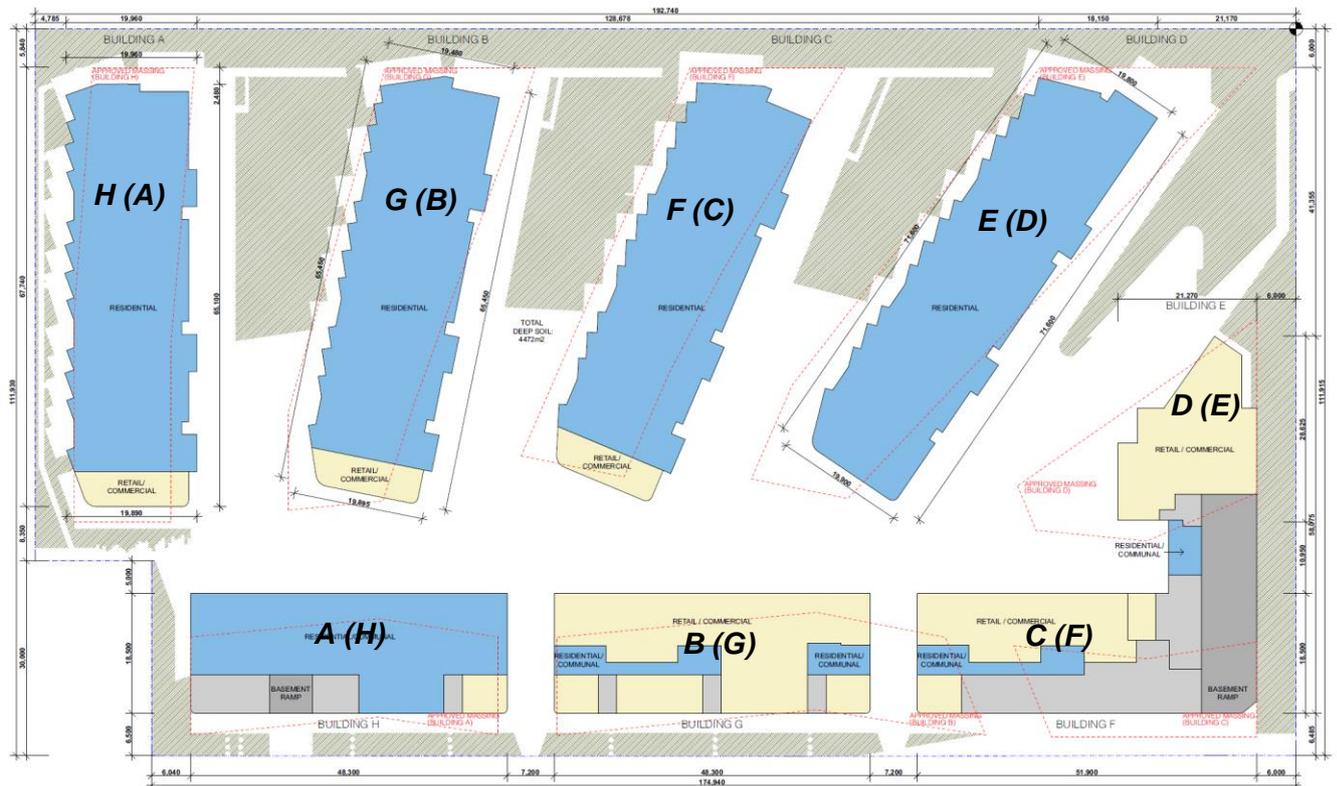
Building layout across the site (these plans do not represent the true building envelopes as they exclude balconies, pergolas and embellishments).
